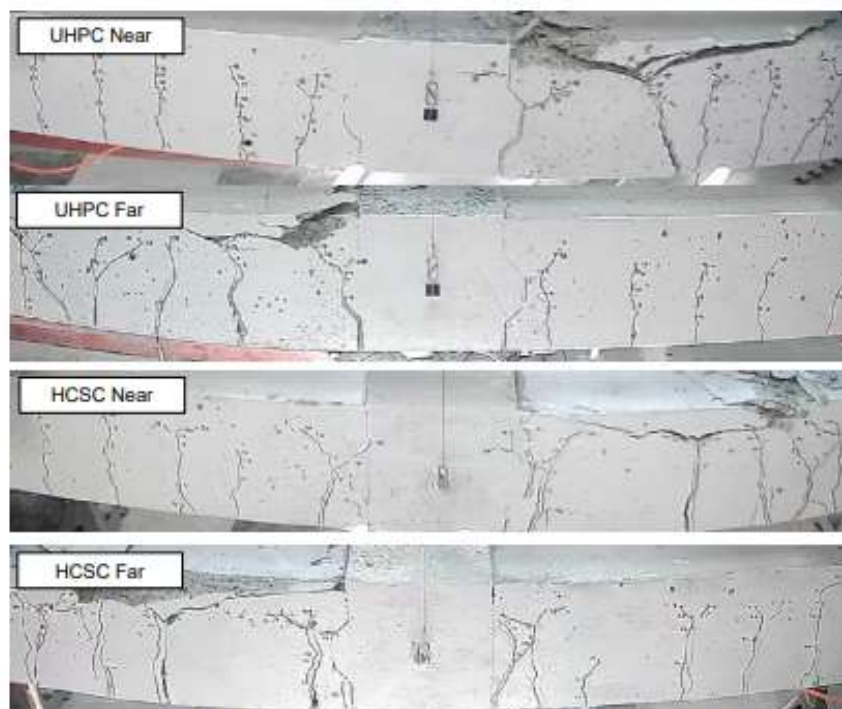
Elevation View of Cracking of D/D Panel Assemblages at Ultimate Flexural Capacity
